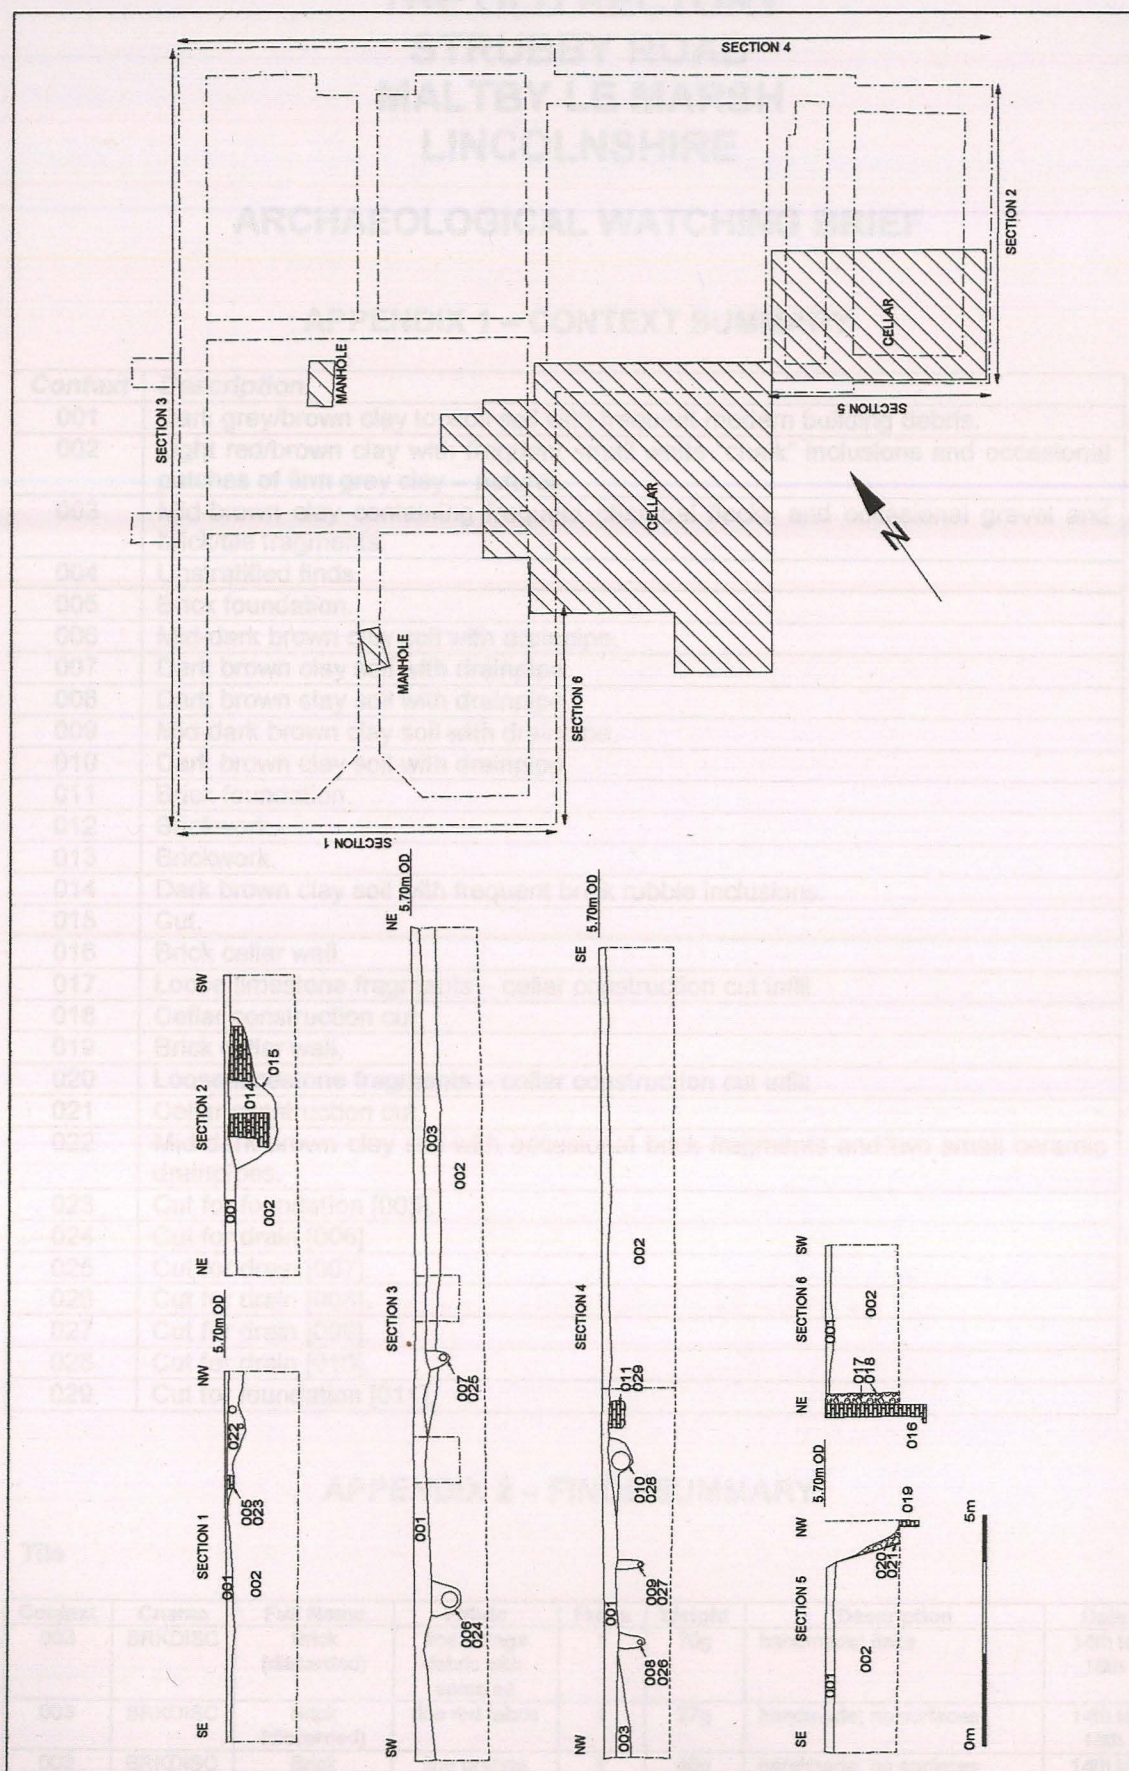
plan of foundation layout showing location of cellars and sections 1 – 6 (not to scale).
